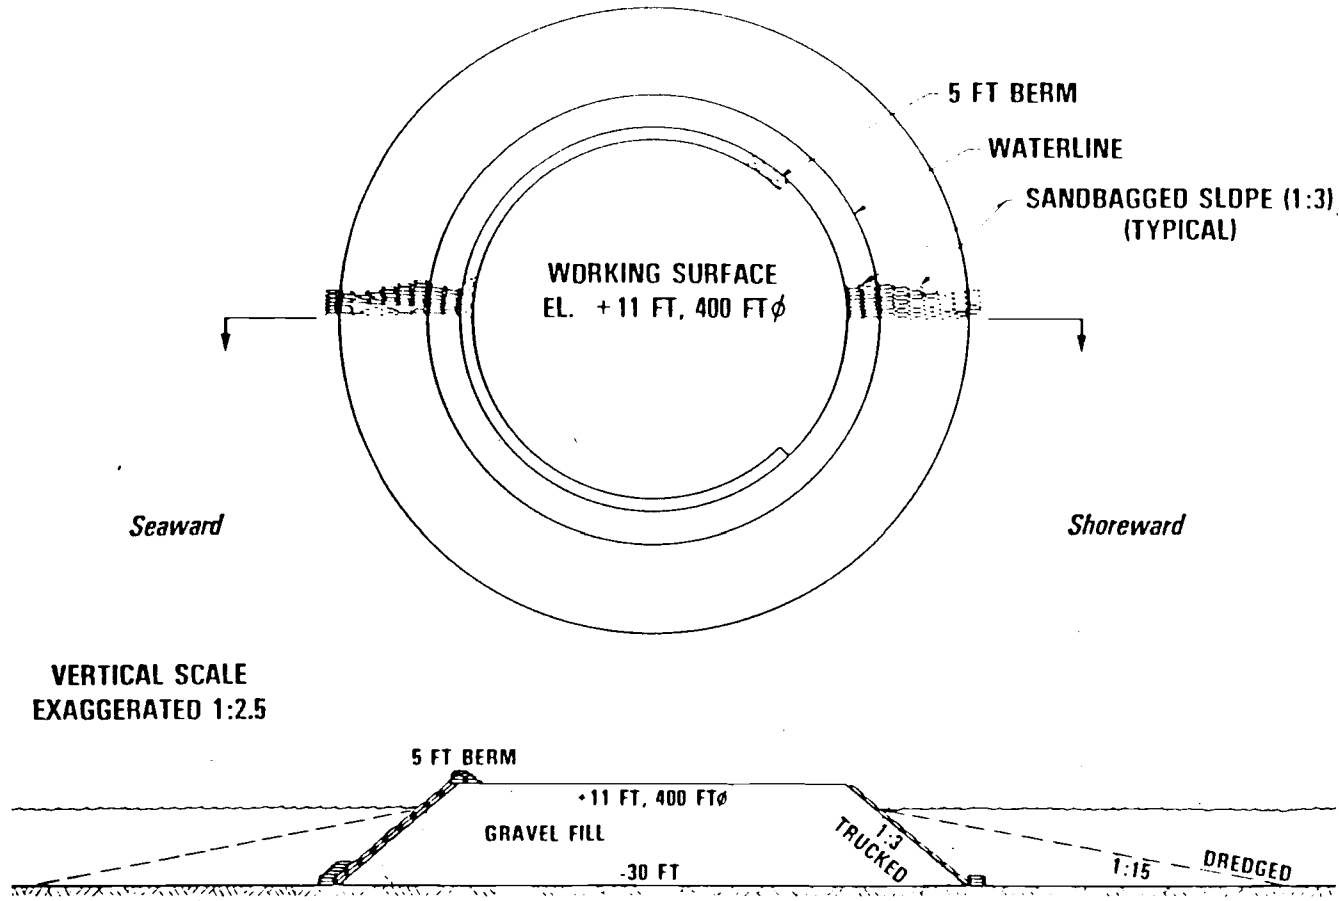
Schematic plan and profile of exploration gravel island in 30 feet of water (after Jahns, 1979)
